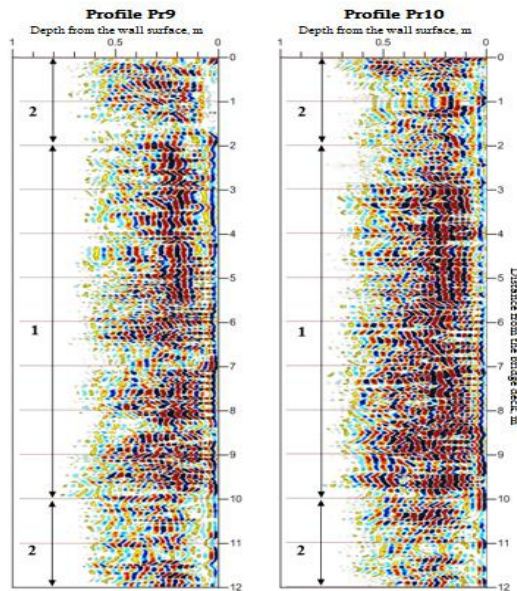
Types of reinforcement found along the western wall along Pr9 and Pr10.
